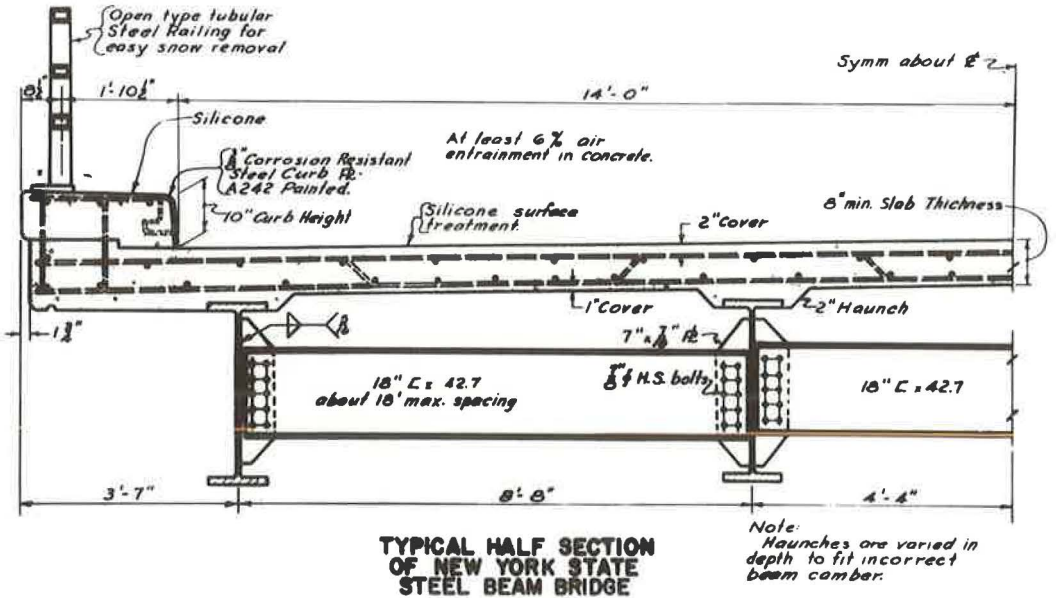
Method used to protect steel I-beam bridge decks from salt damage.
